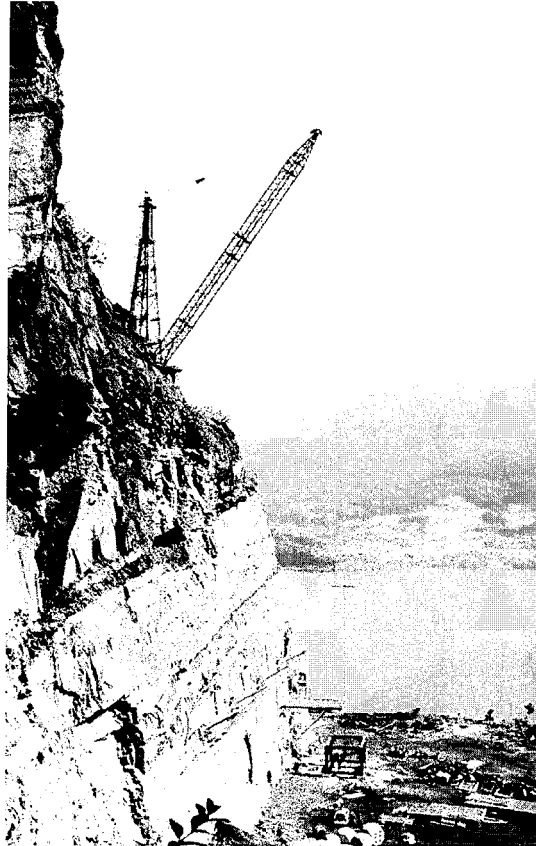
The Swiss Test Facility for Approval in Walenstadt
